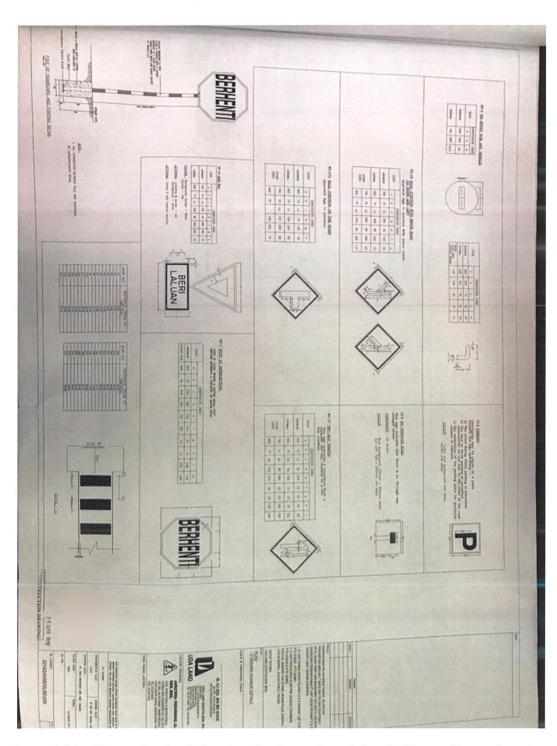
Shows the detail drawing for the road marking for Neuvo Centro 2 project
